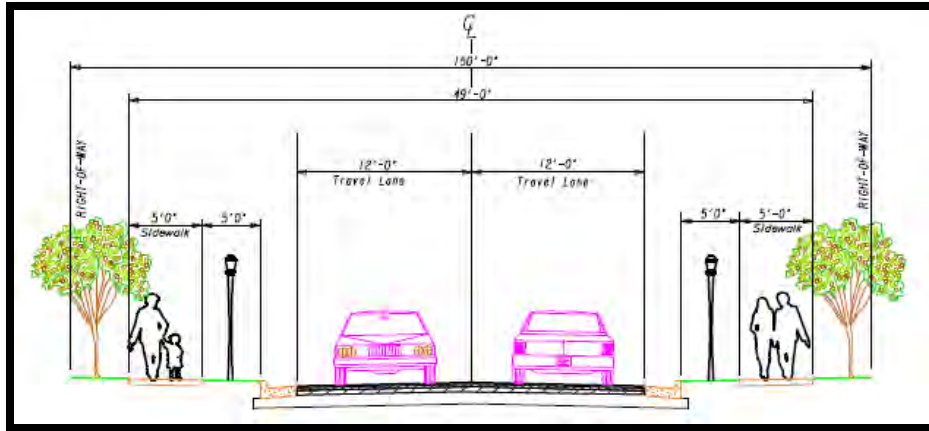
Proposed Typical Section – Alternative 2 – West First Street Extension
